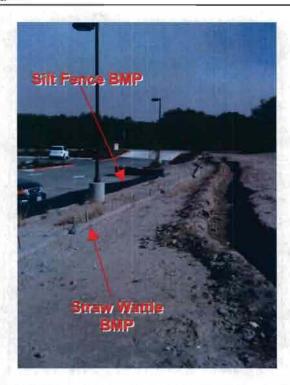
30/40 Ryan Ranch Court – Drainage ditch intended to direct storm water runoff flow off-site. (Note: Straw wattle BMP installed downgradient of drainage ditch)
